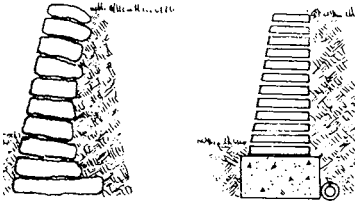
Two types of dry walls. One has a concrete base with tile for drainage, a guard against the wall heaving during freezing weather.
